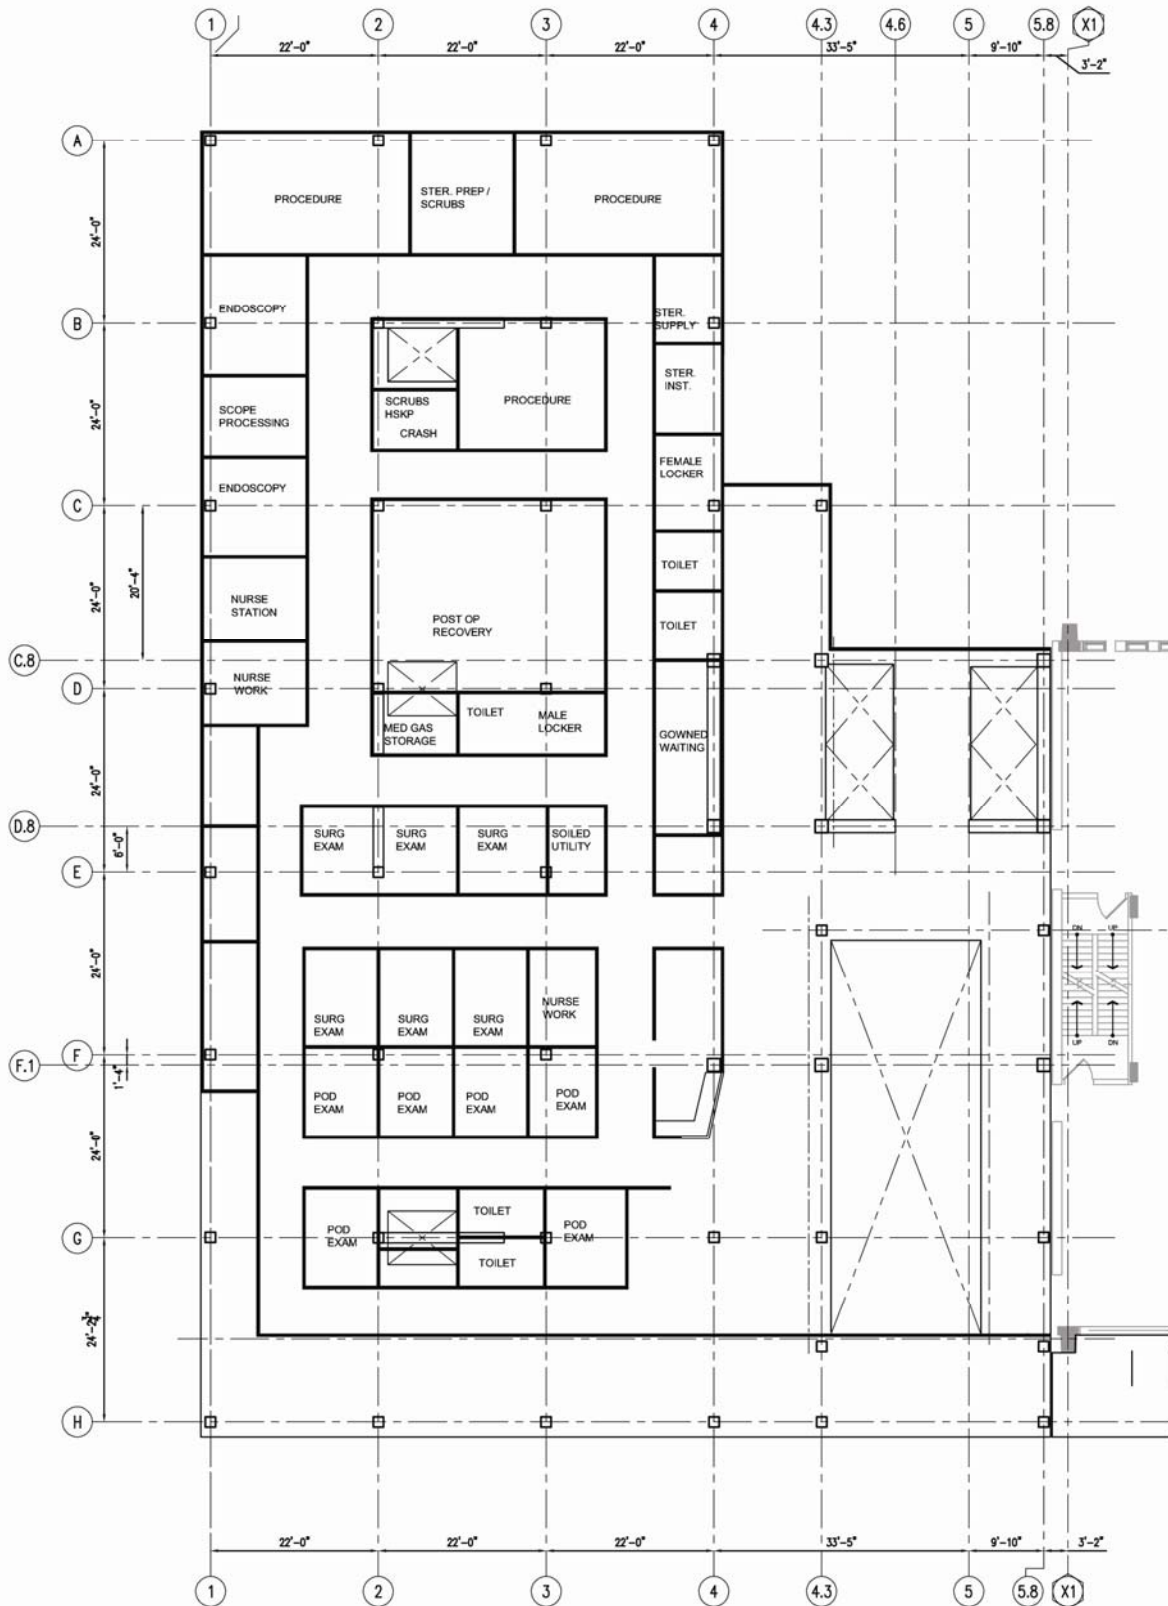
4<sup>th</sup> Floor Room Layout Plan
